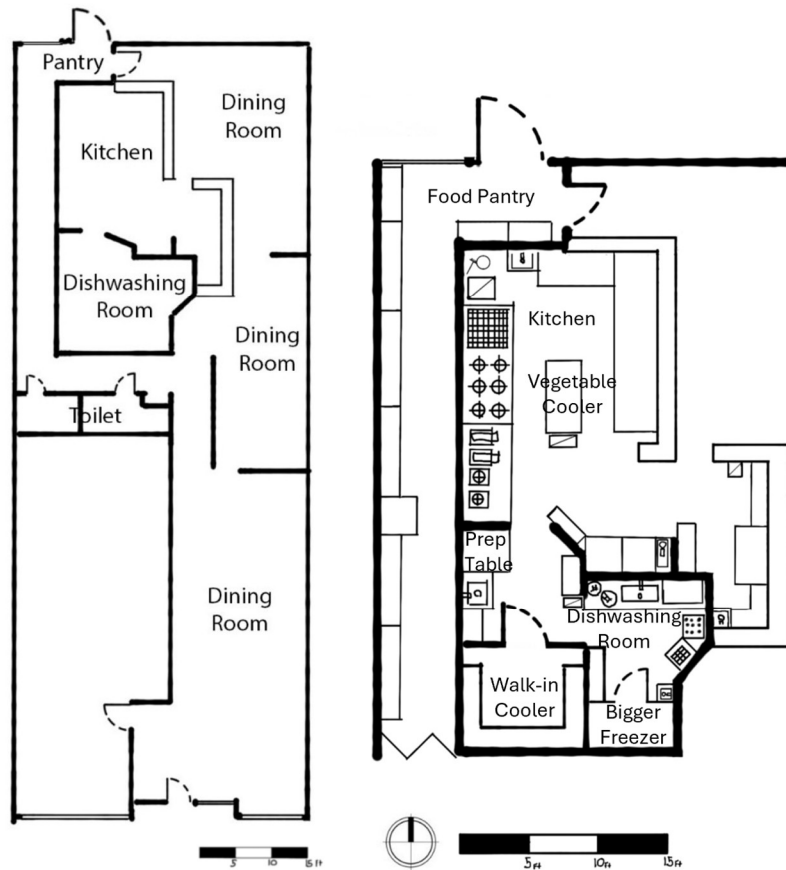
Floor Plan of Chef B's Indonesian Kitchen (Left) & Restaurant (Right)
